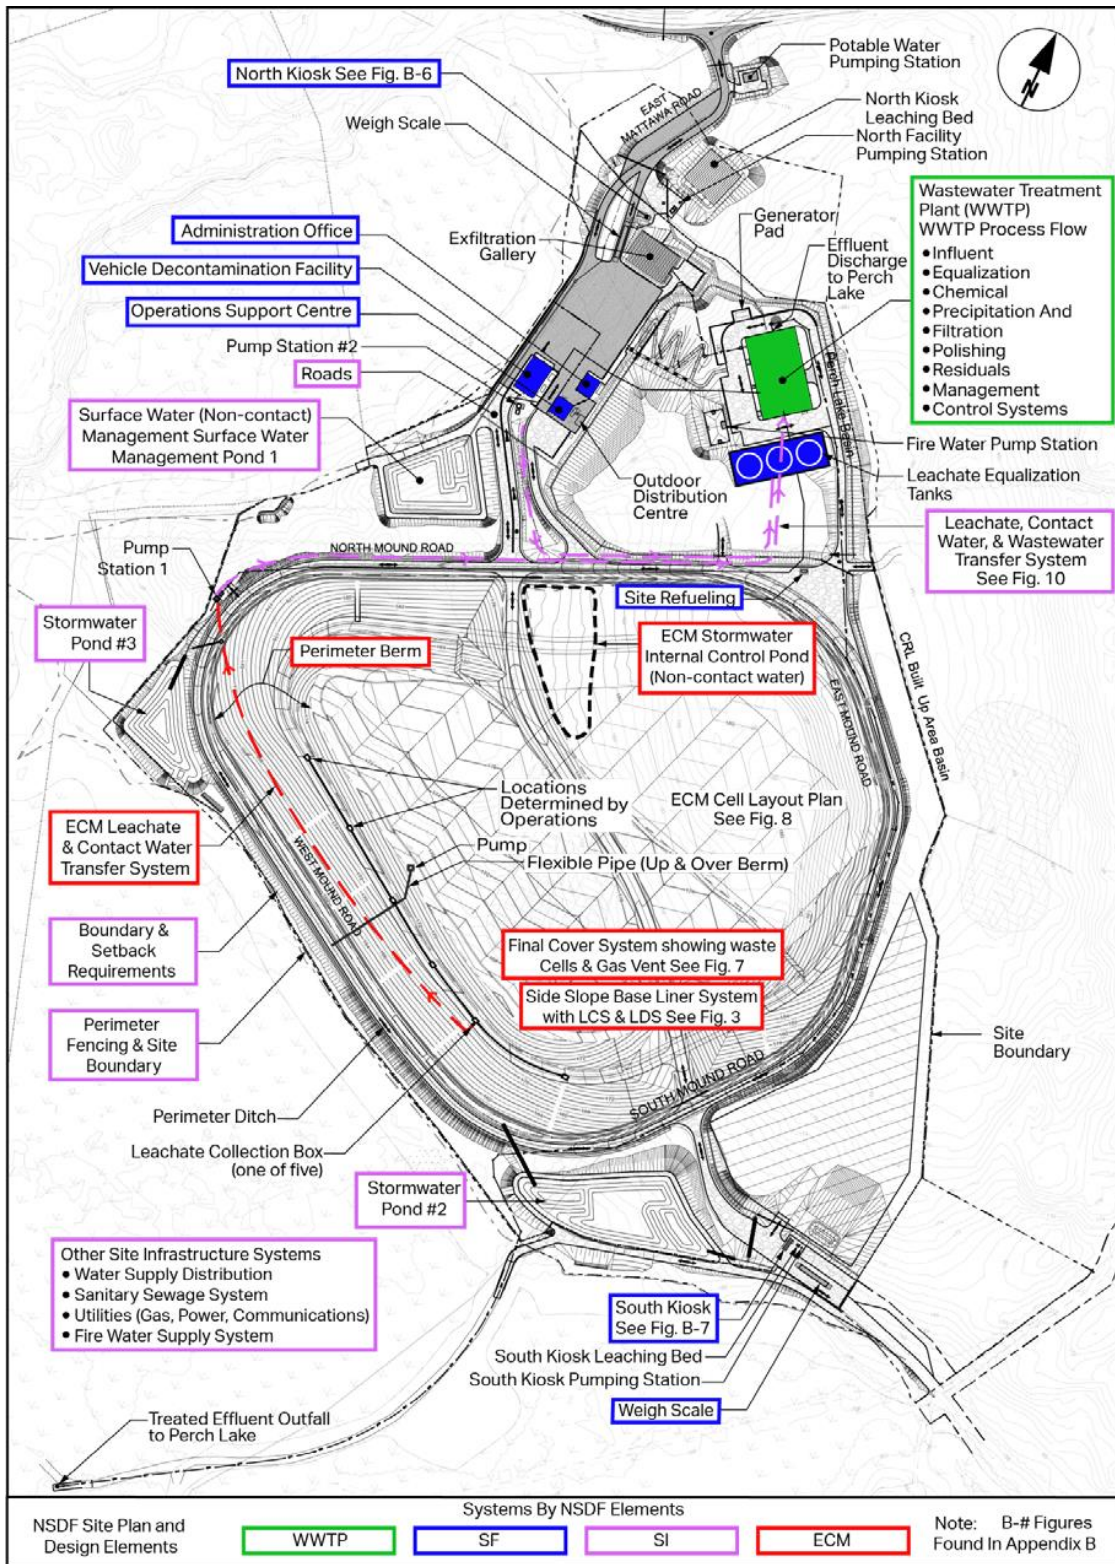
Near Surface Disposal Facility and Design Element Locations
